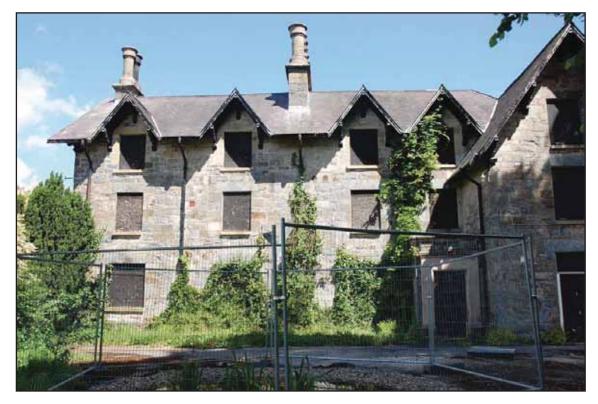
Headmaster's Building - south elevation. Scale: 1.0m
